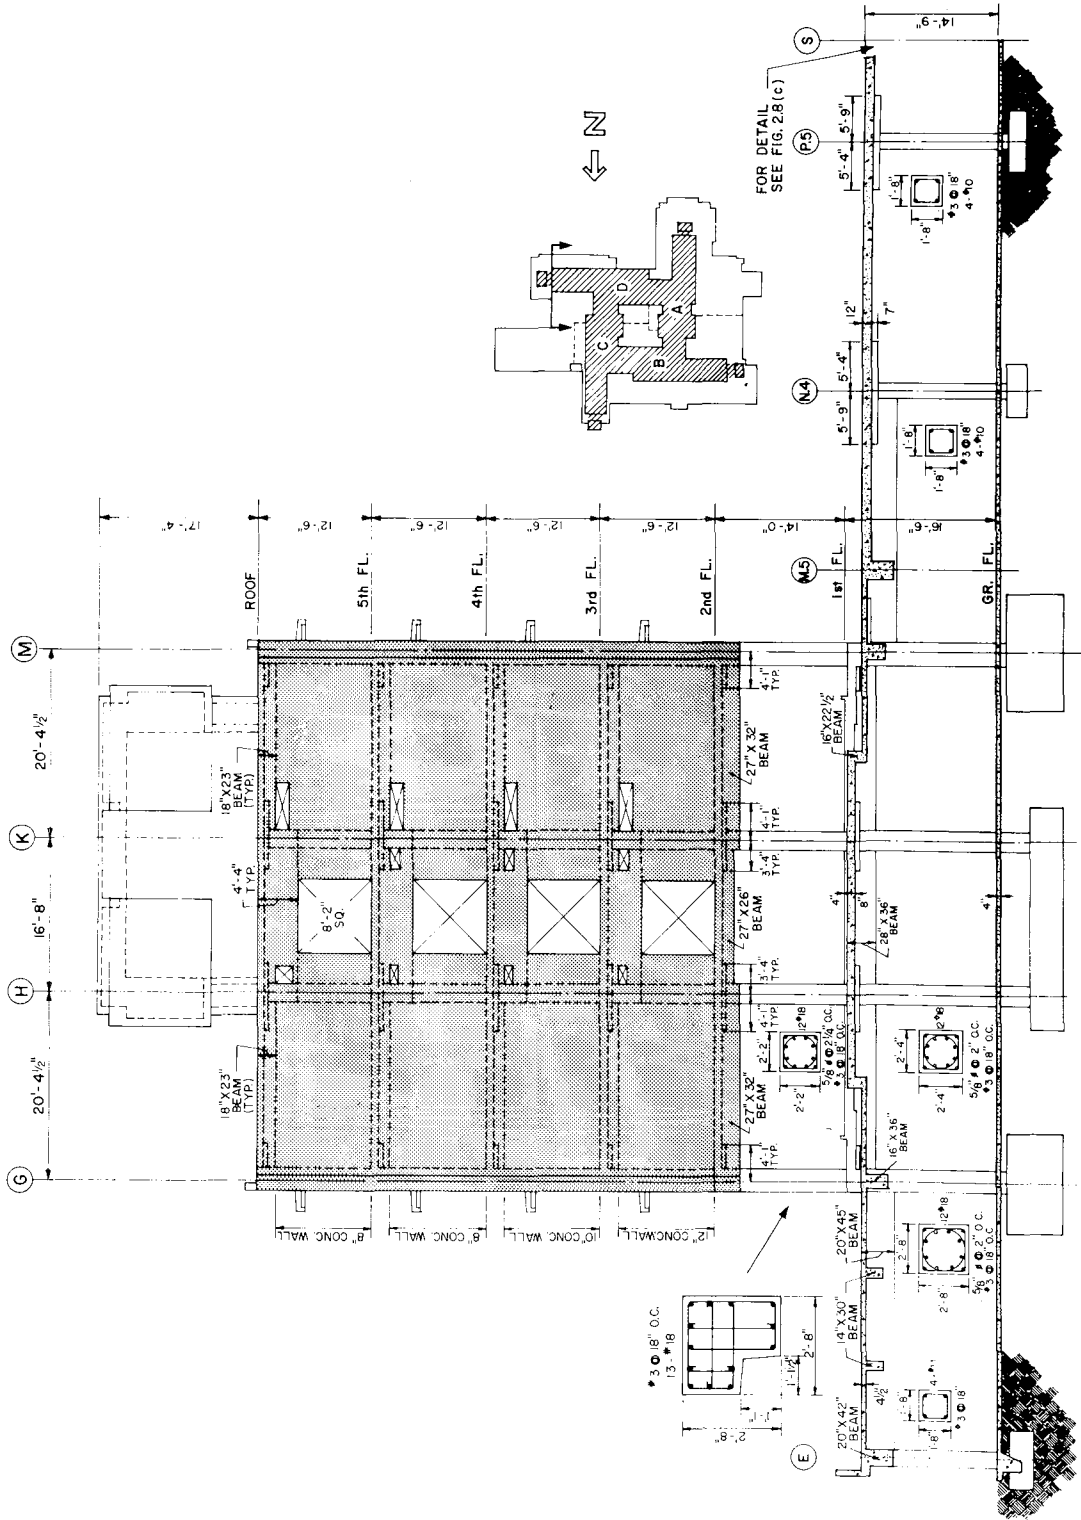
STRUCTURAL DETAILS ALONG FRAME 29, WING D
